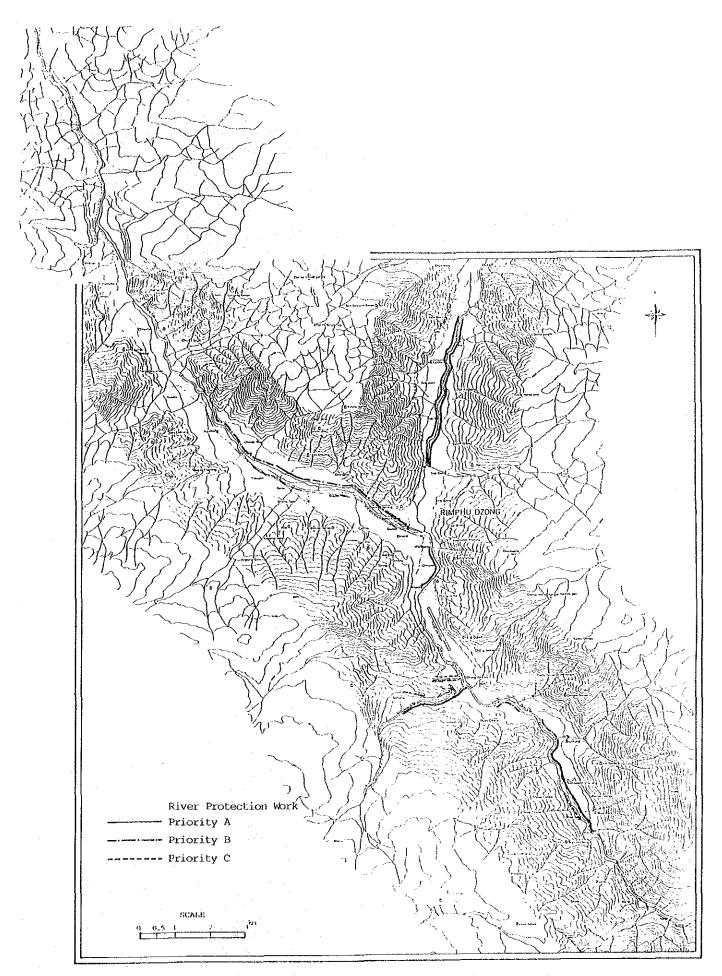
PROPOSED RIVER PROTECTION WORKS
